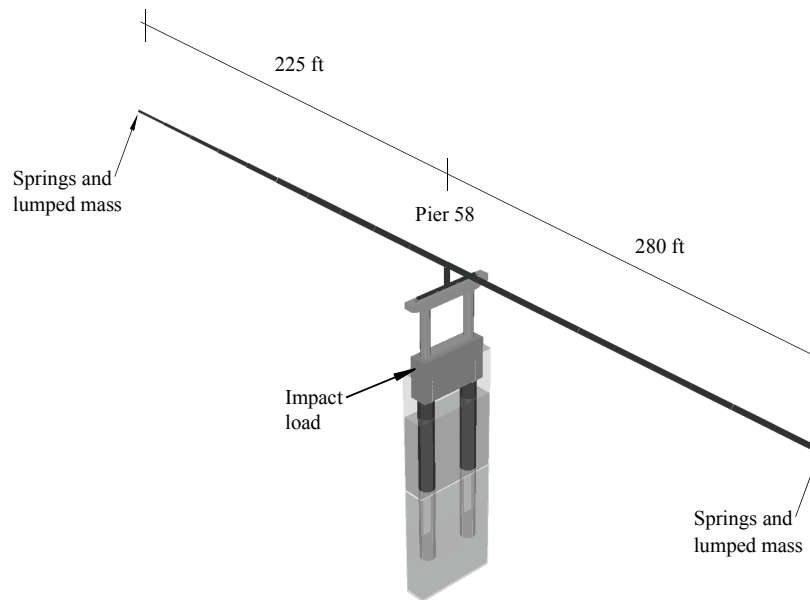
SR 20 at Blountstown, Pier 58 OPTS (BLT-CHA) model
